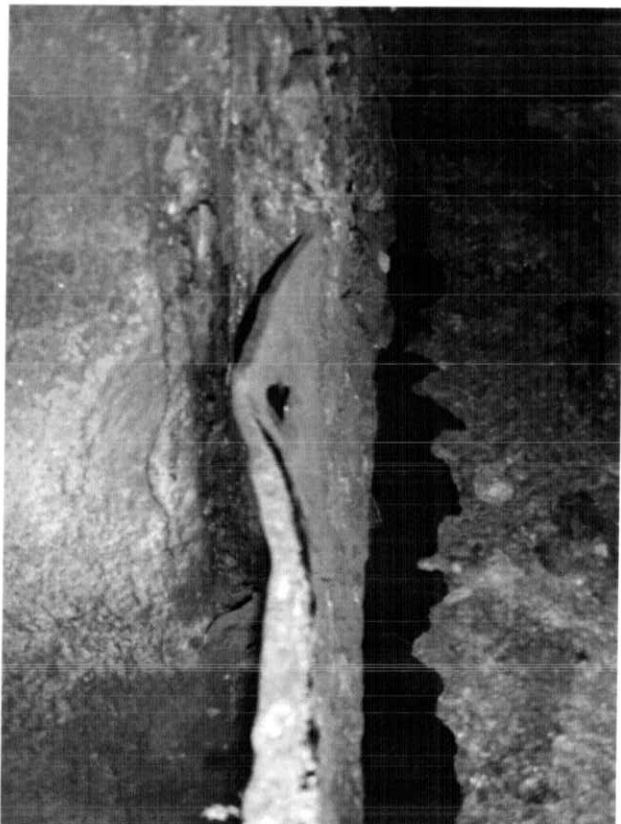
BOTTOM FLANGE BEAM # 5 NORTH SIDE AT PIER, IN SPAN # 1 IN FRONT OF BEARING AREA.
